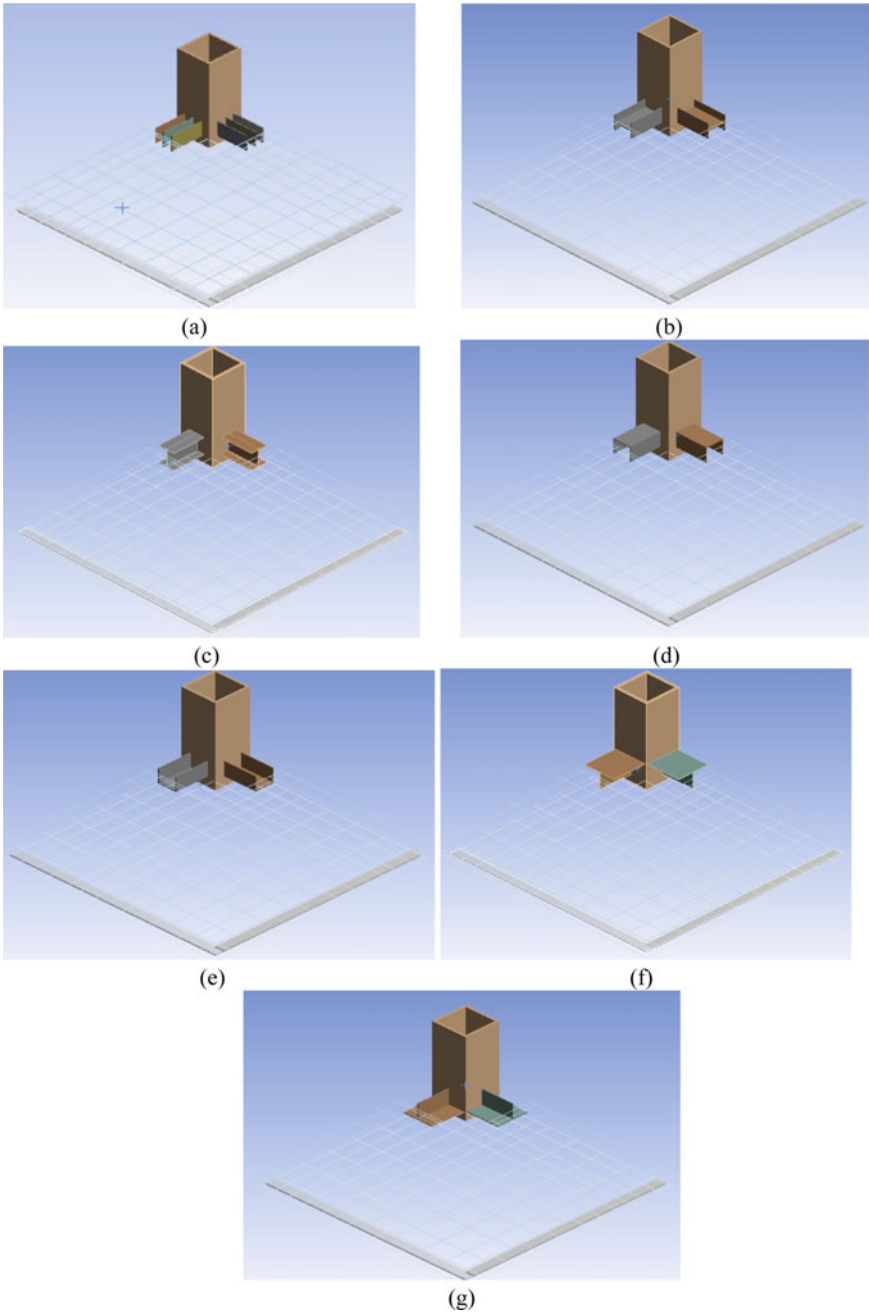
Details of shear connectors used in modeling: a Vertical plate; b H-shaped cross-section; c I-shaped cross-section; d C-shaped cross-section; e U-shaped cross-section; f and g T-shaped cross-section
